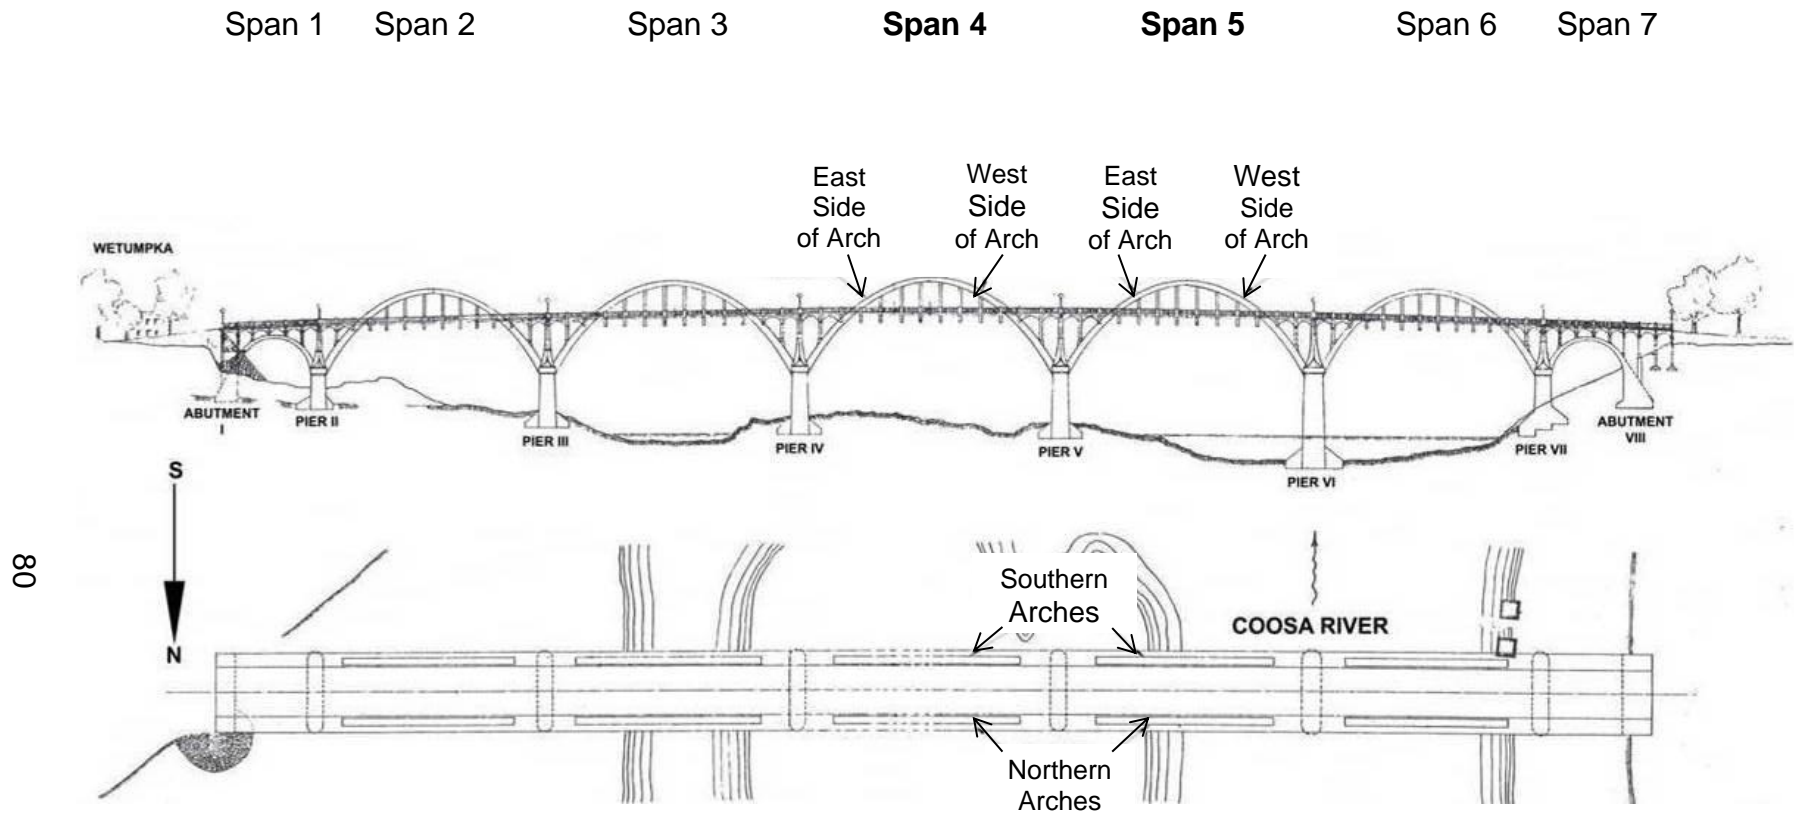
Elevation and plan view of Bibb Graves Bridge (Adapted from ALDOT 2010)
